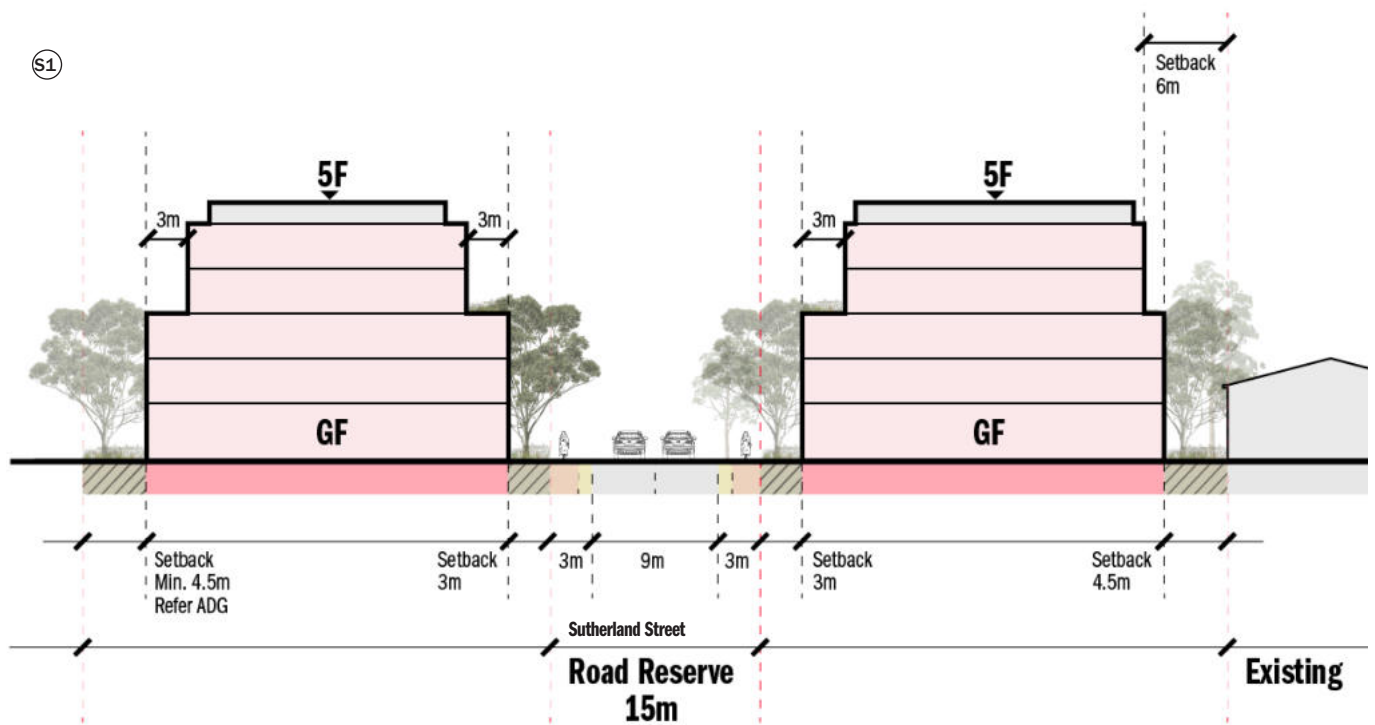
Section 1 - Section through Sutherland Street showing typical street wall heights and front setbacks
